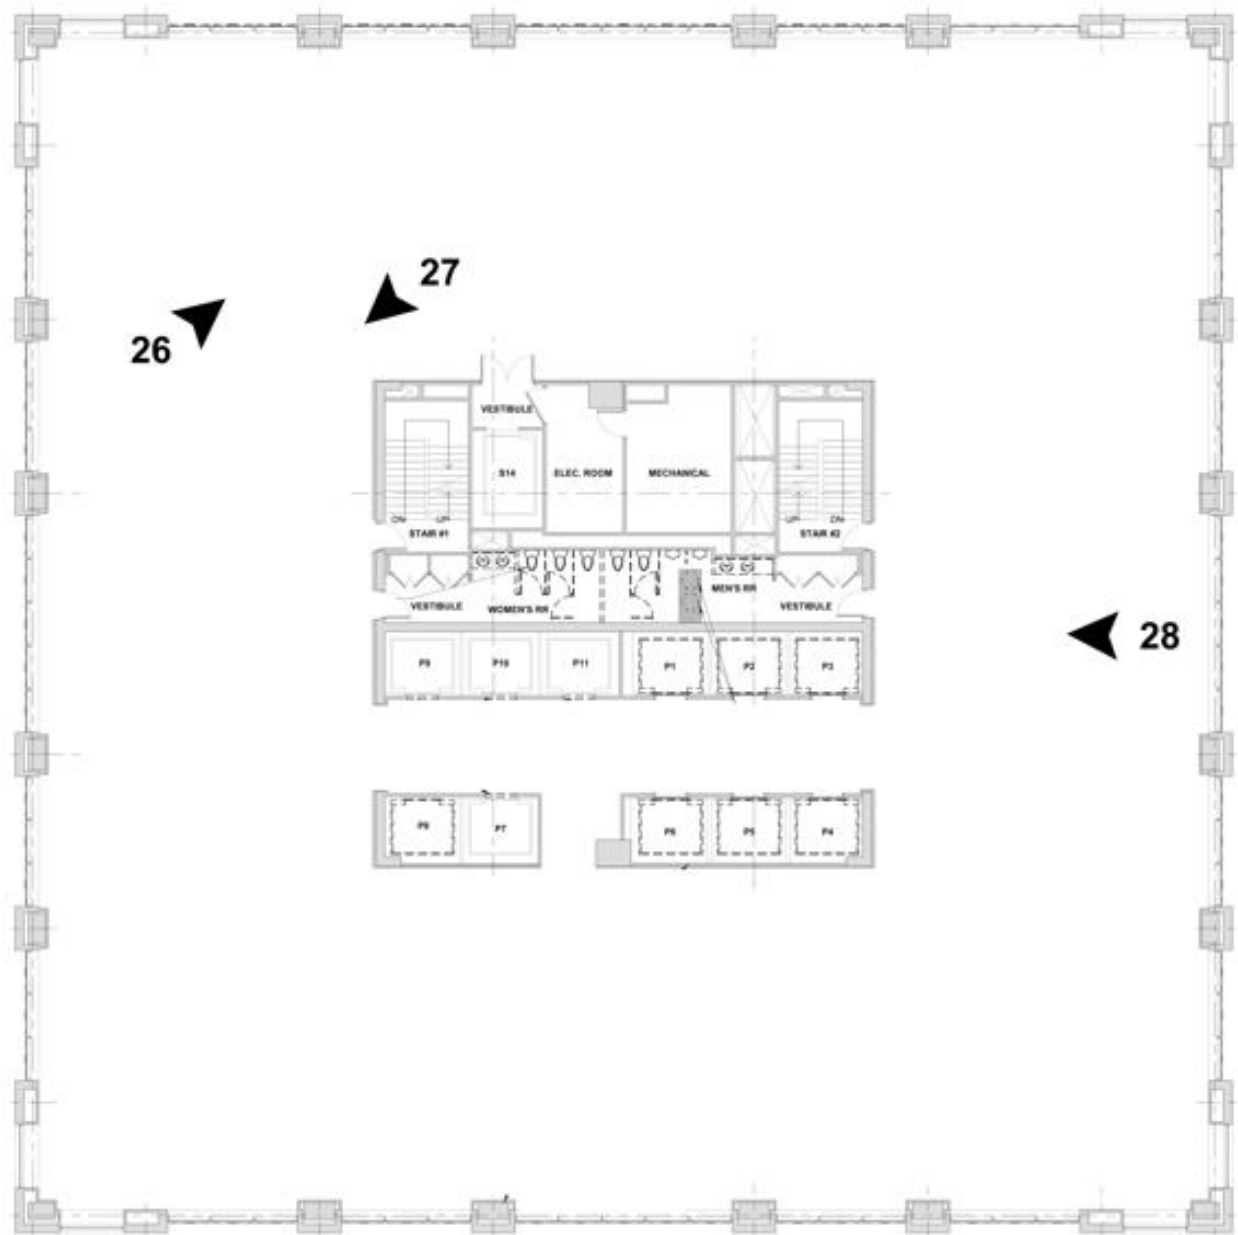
Ninth floor & photo plan. Base plan from SCB Architects, 2024.
